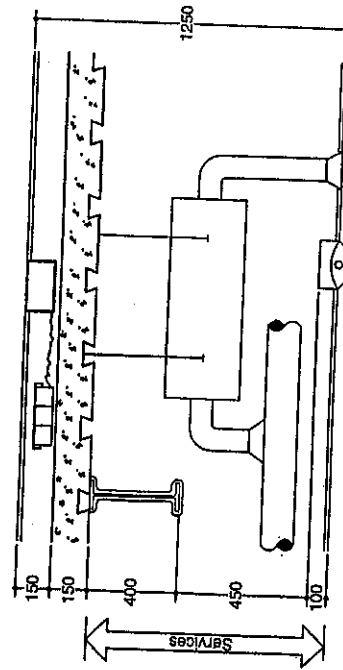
Secondary distribution in ceiling: steel frame metal deck, small raised floor, full access false ceiling, recessed light fittings. (Source: J. Berry, Ove Arup and Partners.)
